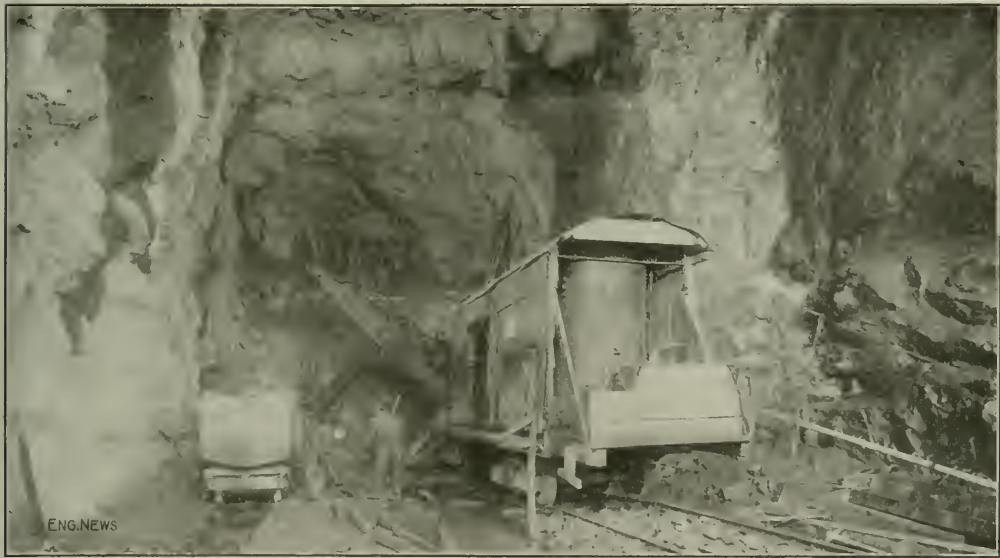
VIEWS IN LEXINGTON AVE. TUNNEL
